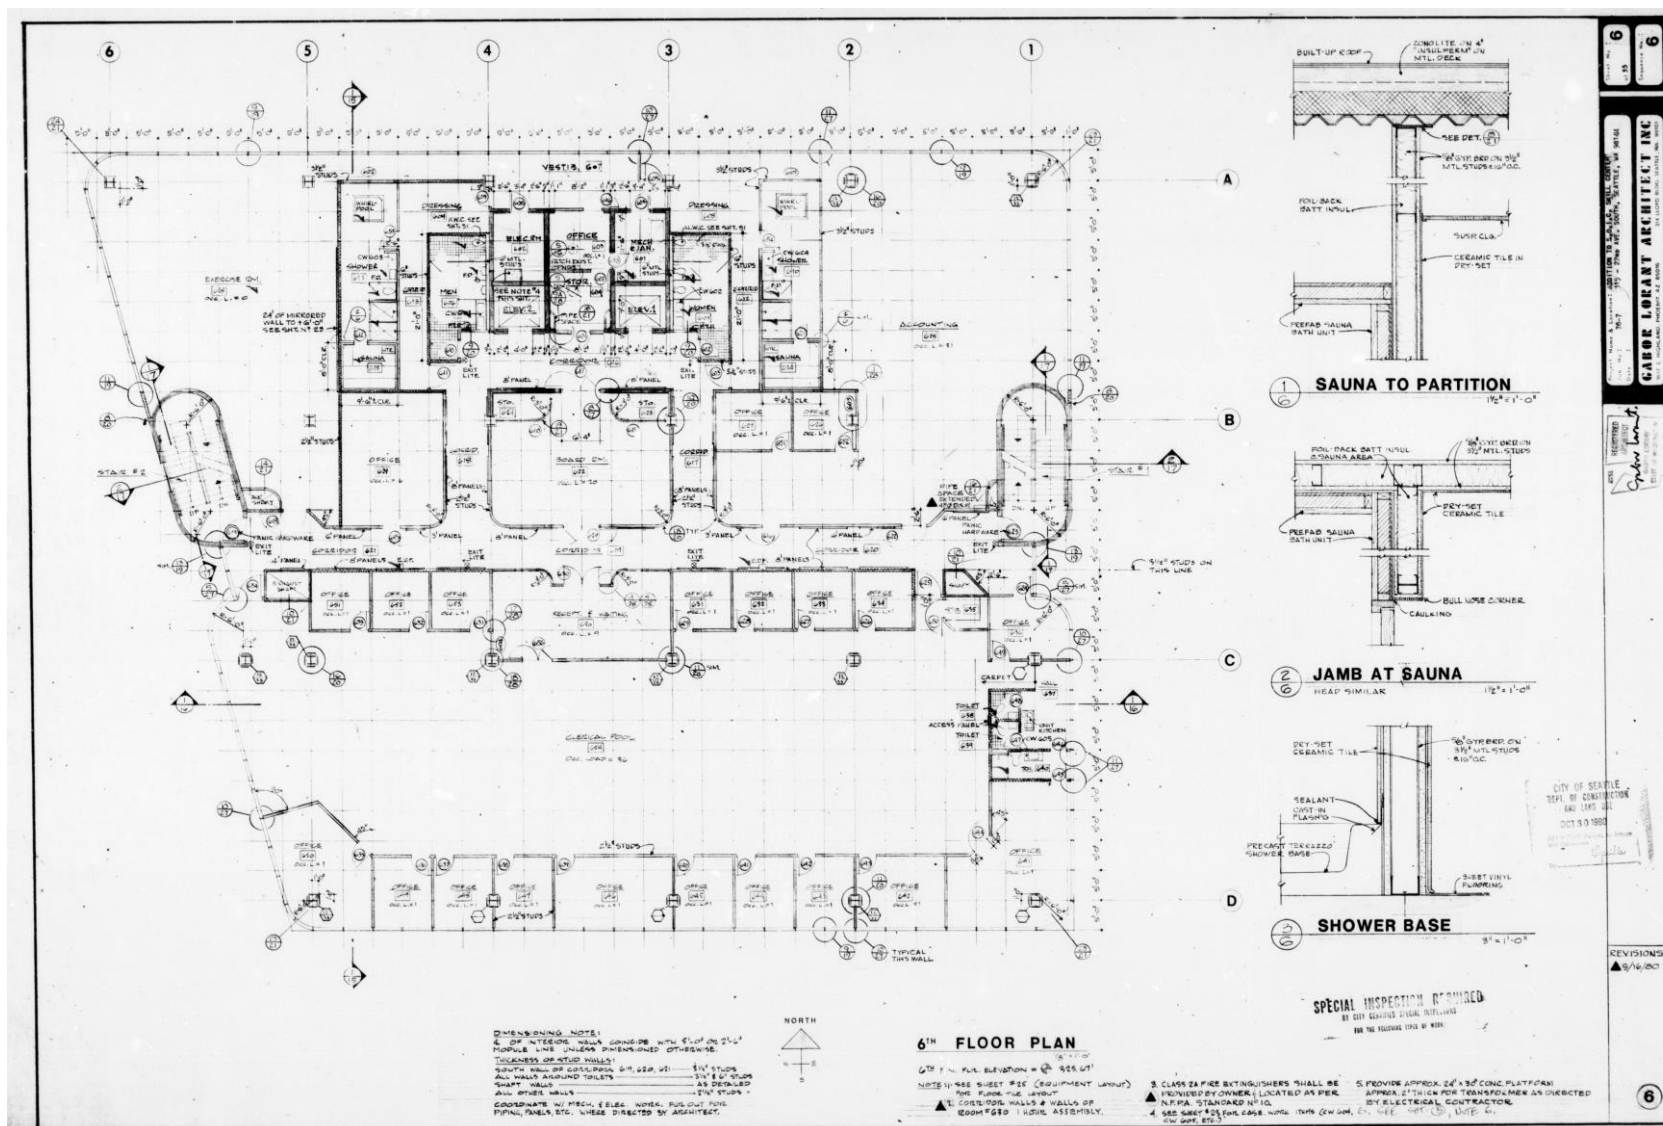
Sixth Floor Plan by Gabor Lorant, 1980
